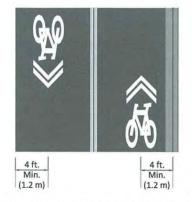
Typical Shared-Lane Marking Cross Section on Street with No On-Street Parking
